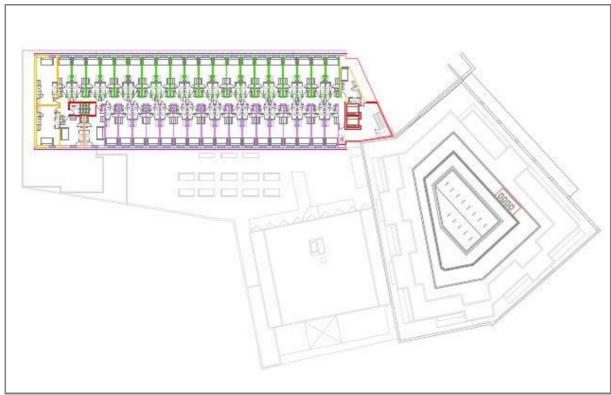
Proposed 7th Floor Plan - Contemporary Design Solution LLP
